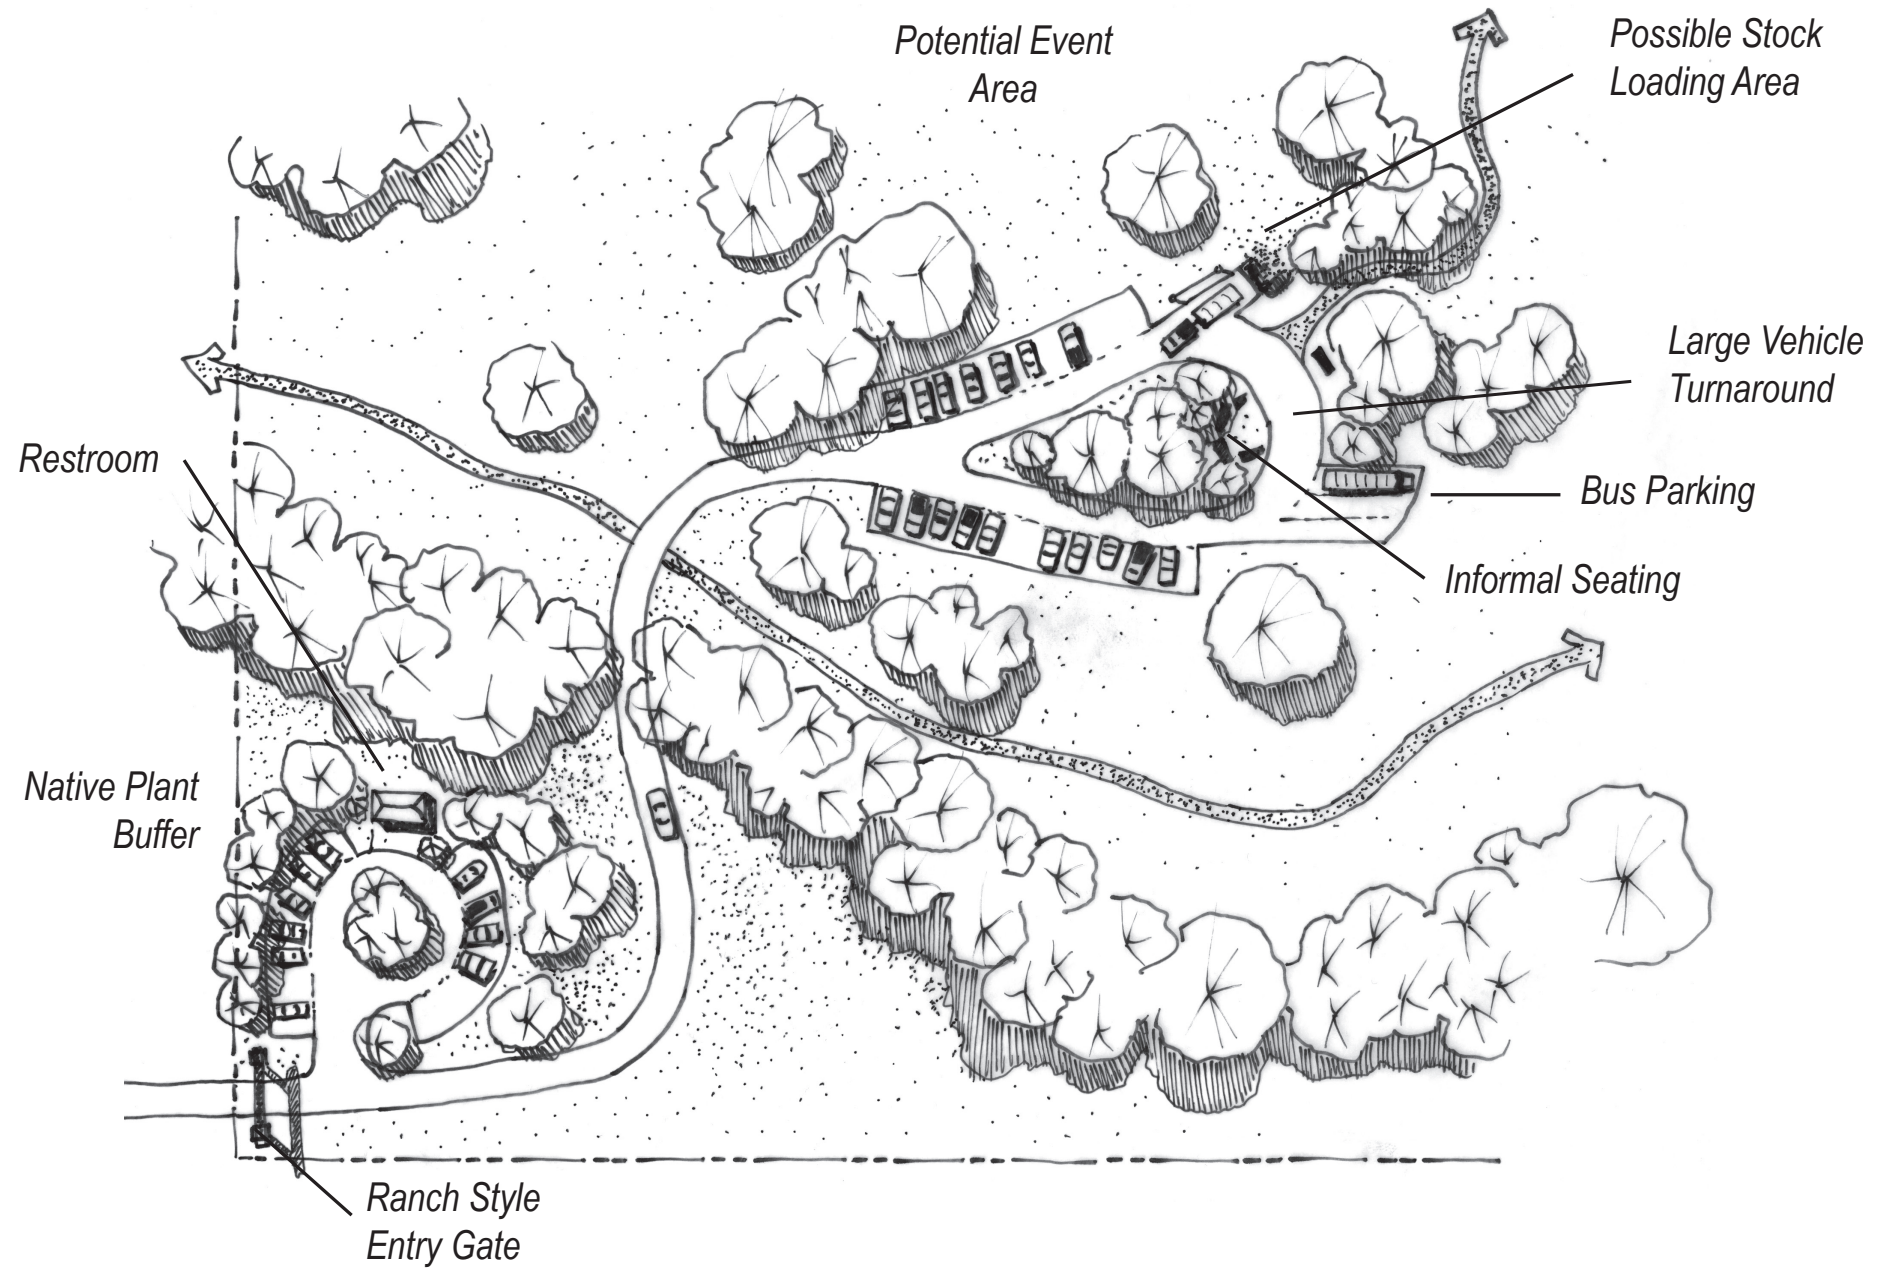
Illustration of potential layout of the parking area located within the floodplain off Oxford Road.
